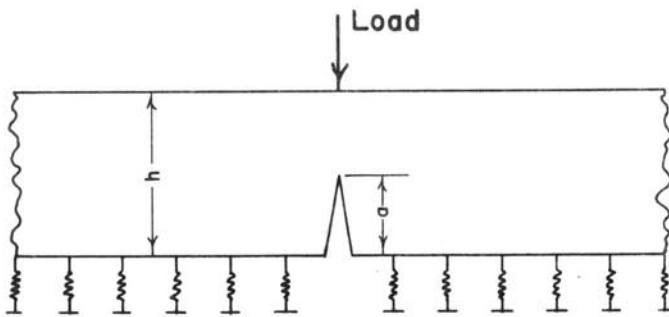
CRACKED RIGID PAVEMENT
